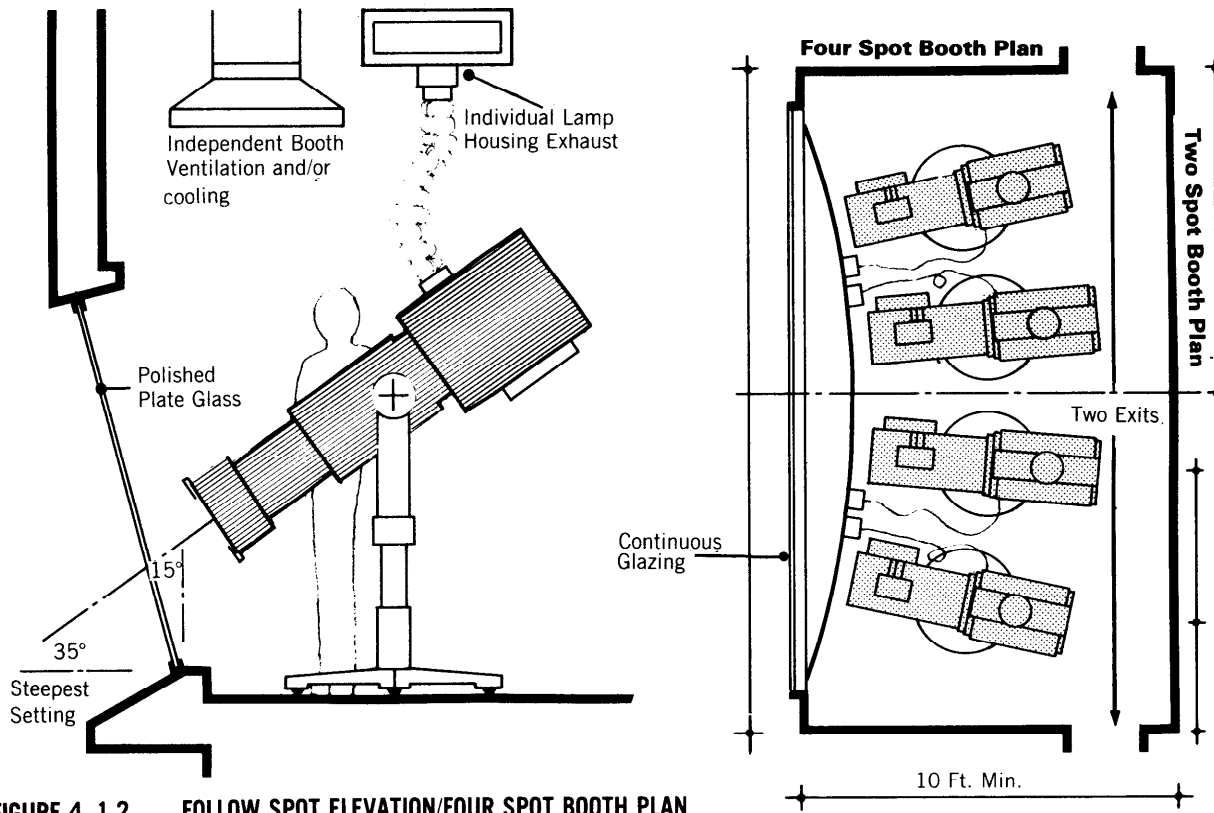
FOLLOW SPOT ELEVATION/FOUR SPOT BOOTH PLAN
